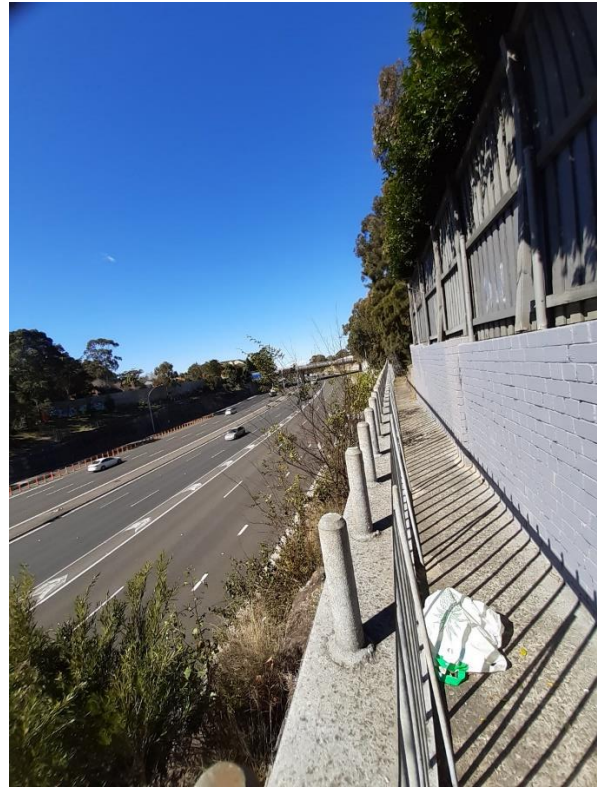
Proposed Location of RMS noise wall at North Eastern end of St Thomas Rest Park adjacent to Warringah Freeway
